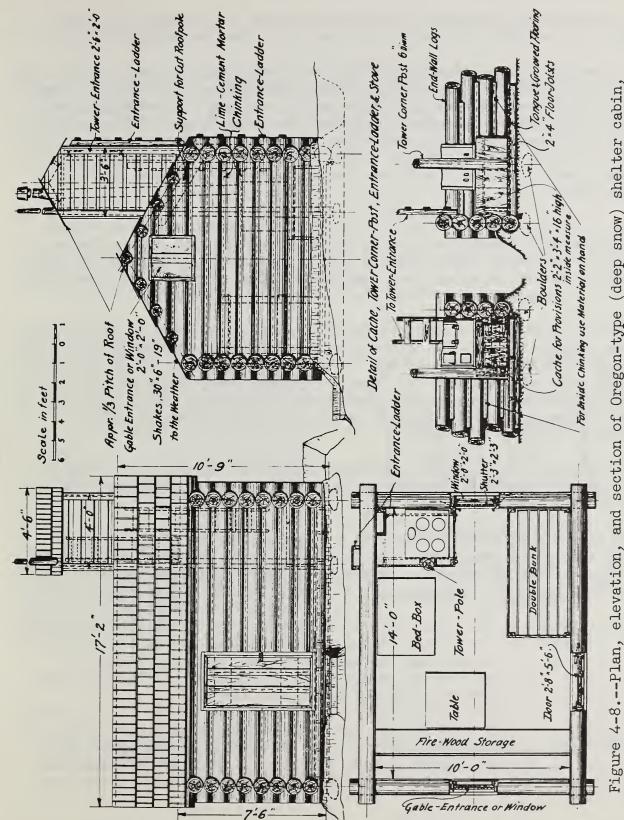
Plan, elevation, and section of Oregon-type (deep snow) shelter cabin, including Santa Claus chimney.
